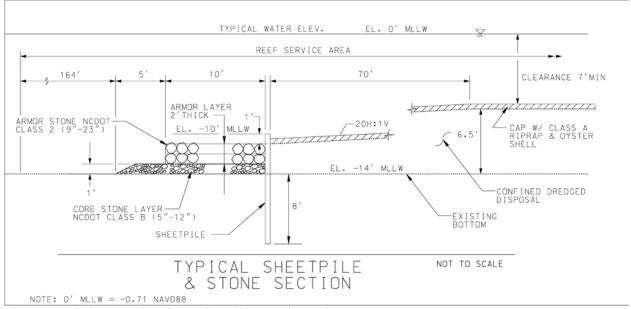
Typical cross section of sheetpile wall & stone sill containment structure
